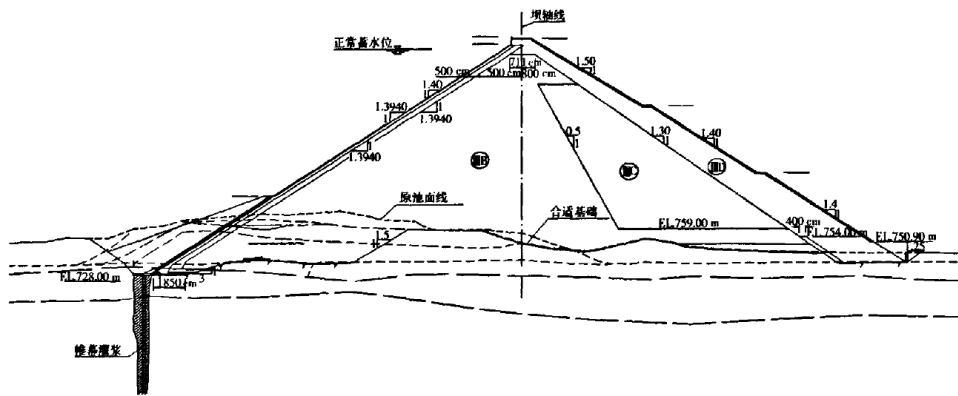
Typical section of Zipingpu dam (Chen 2008)
